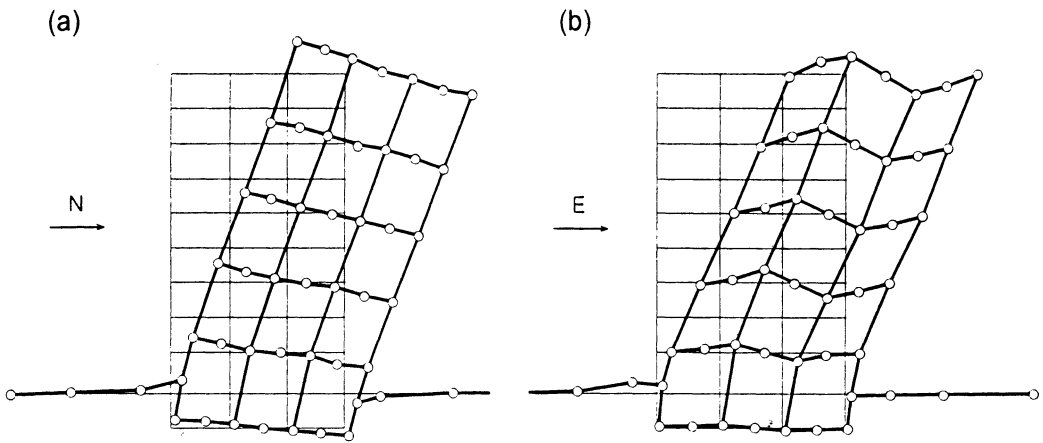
Deformation of a nine-storey reinforced concrete building excited at the roof by a shaker with two counter rotating masses [11] (a) along the west shear wall, and (b) along a section through the elevator core.
